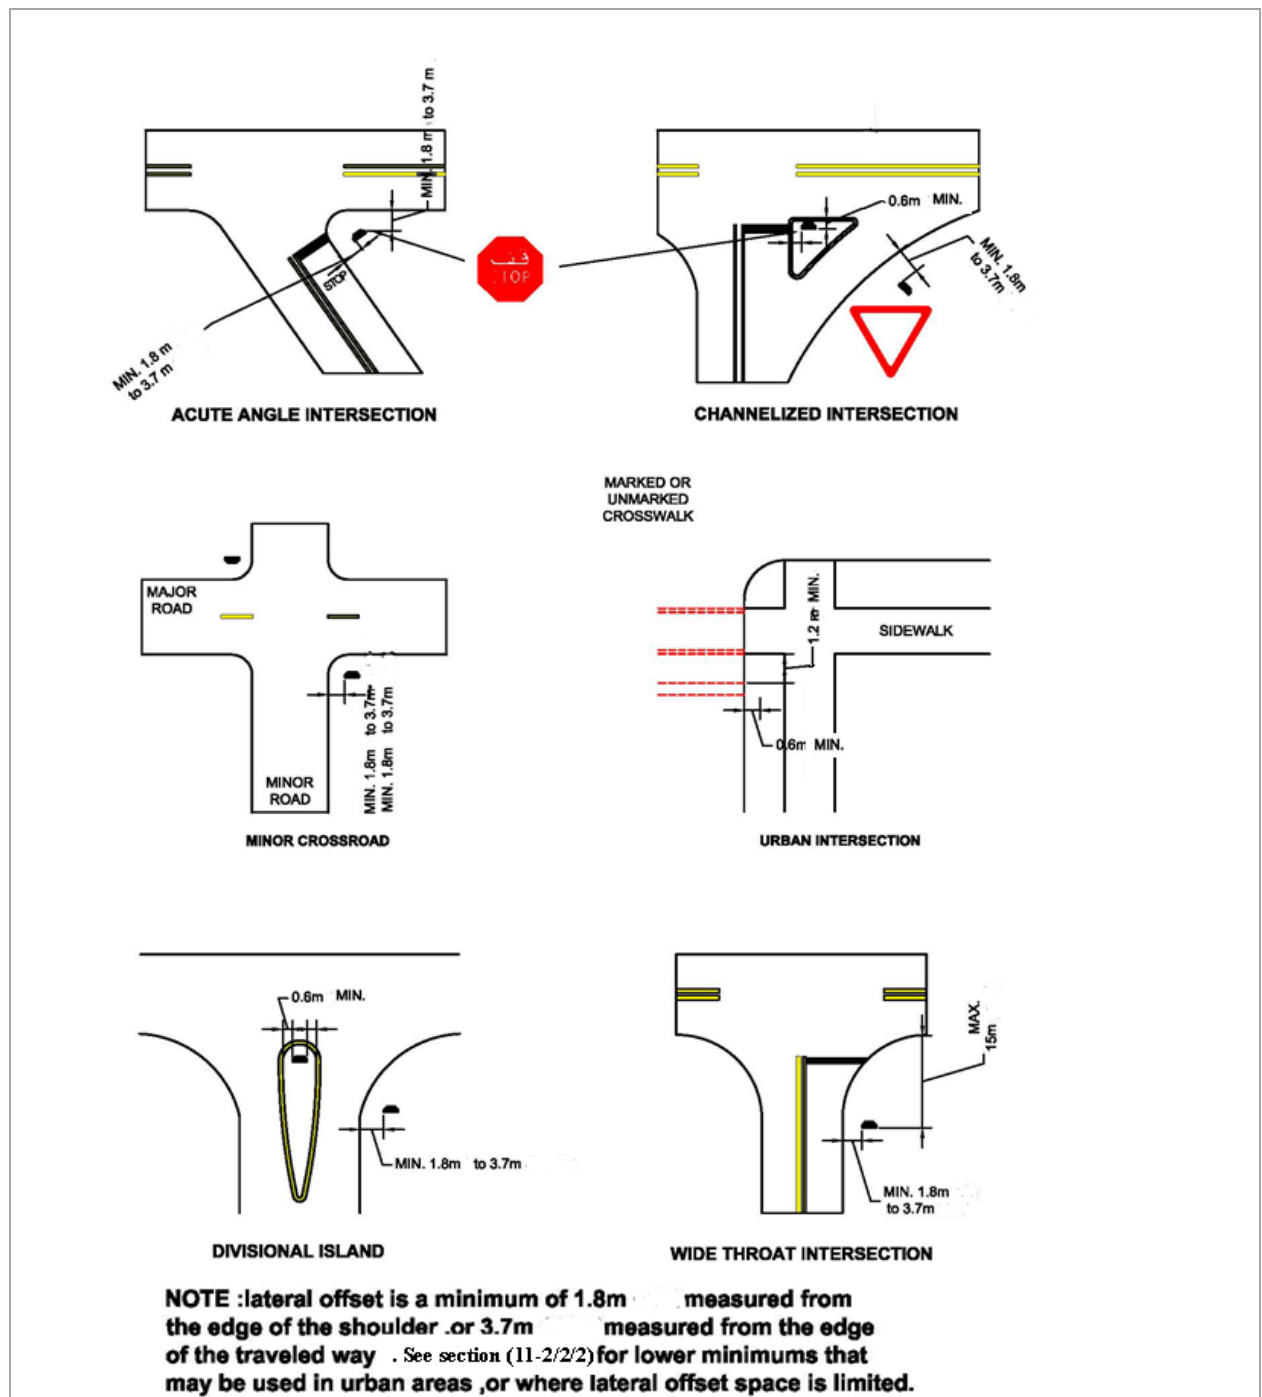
/3: Examples of Locations for Some Typical Signs at Intersections [1, p.39]
